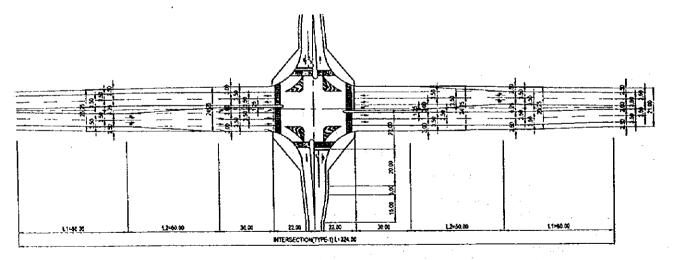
TYPICAL LAYOUT OF INTERSECTION (Phase-2, Without An Frontage Road)
